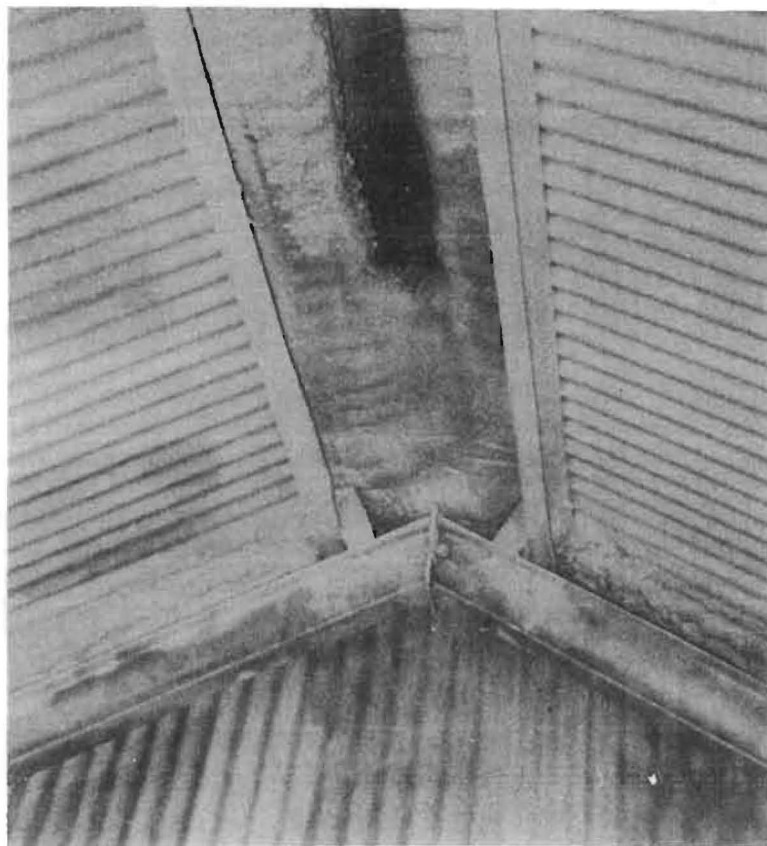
Sealing inside the roof ridge line of a horizontal storage.
